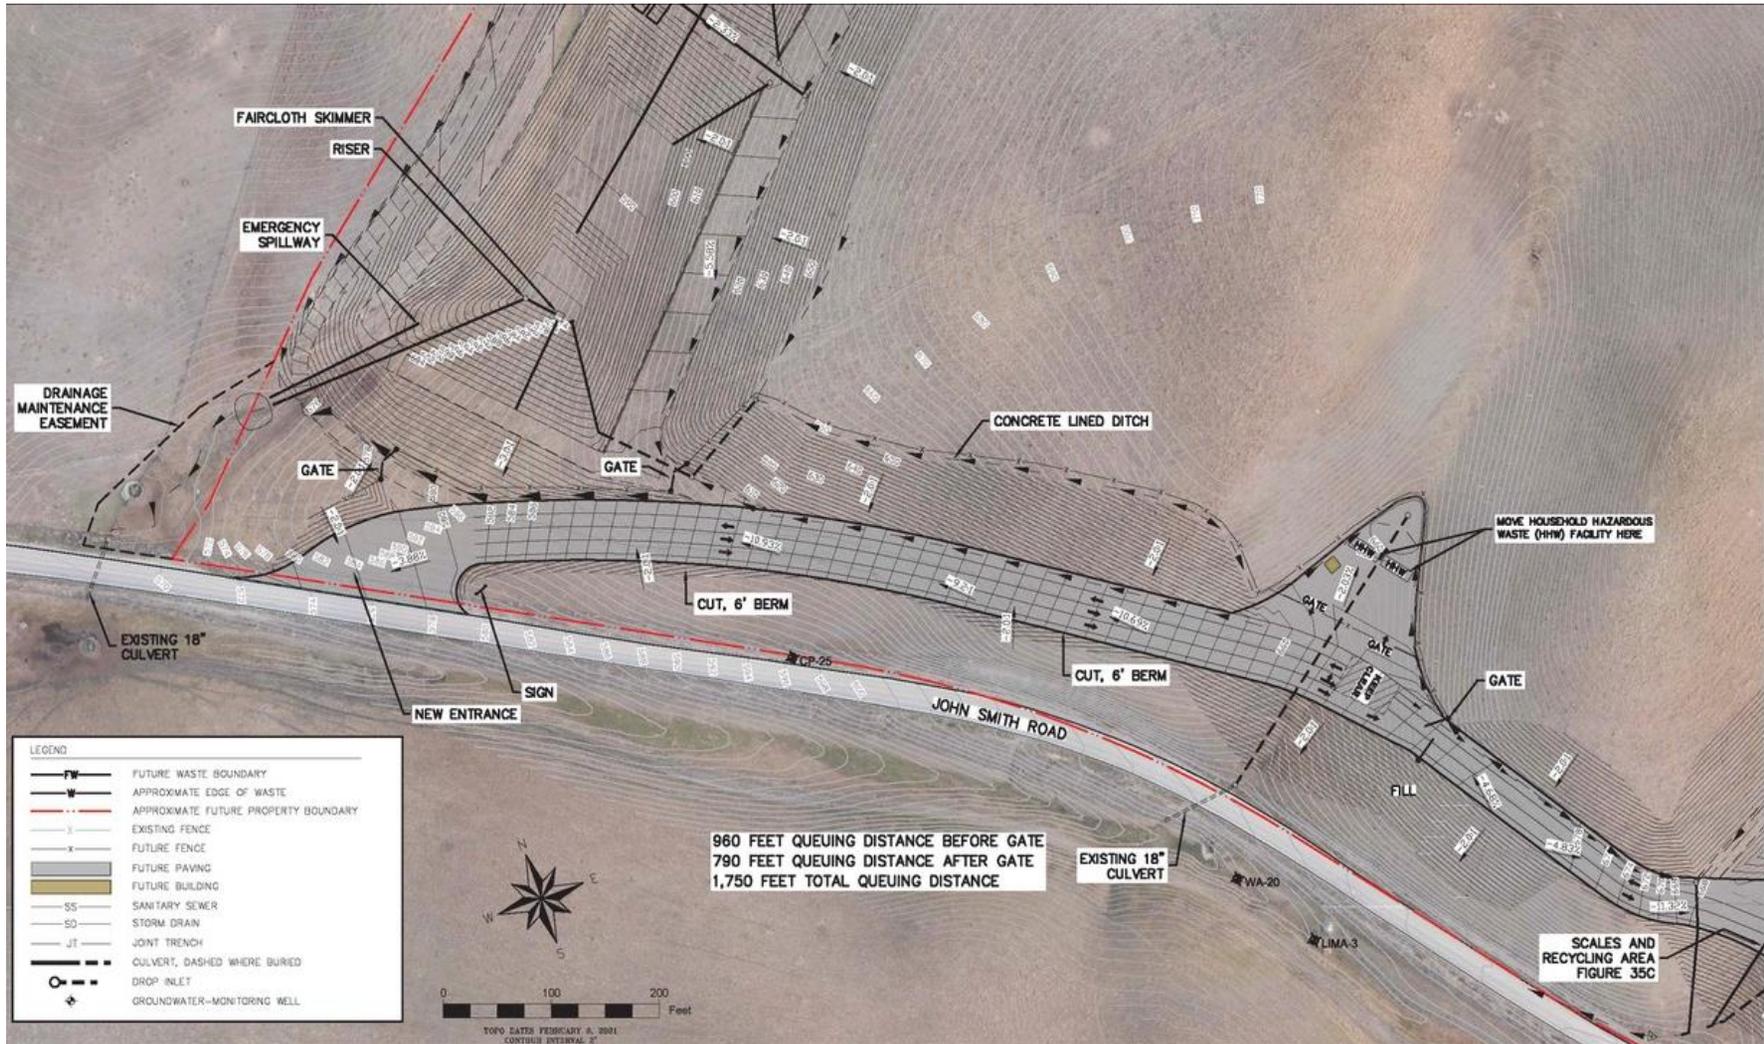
Proposed John Smith Road Landfill Entrance (source: Lawrence & Associates 2021)
